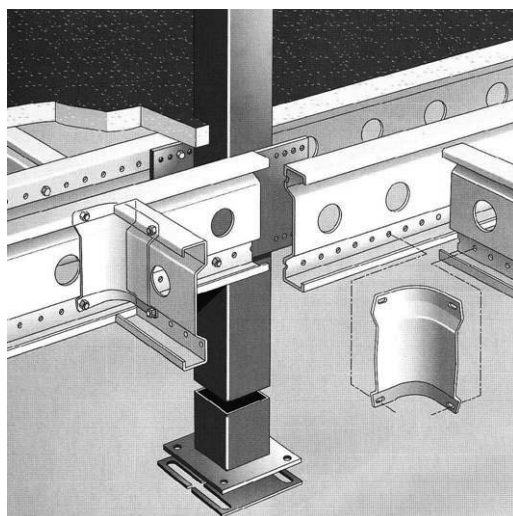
Example of storage flooring system composed of steel beams with web openings.
